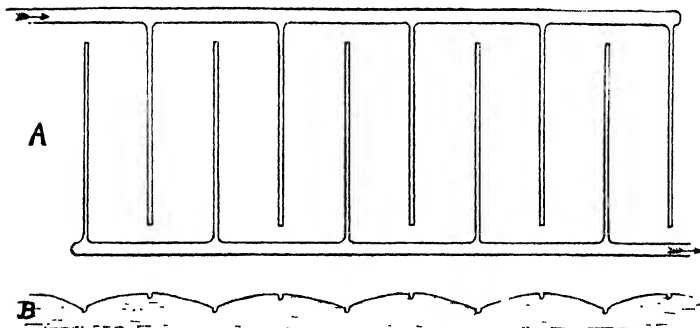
Ridge-and-furrow irrigation. A, Plan B, Section.
